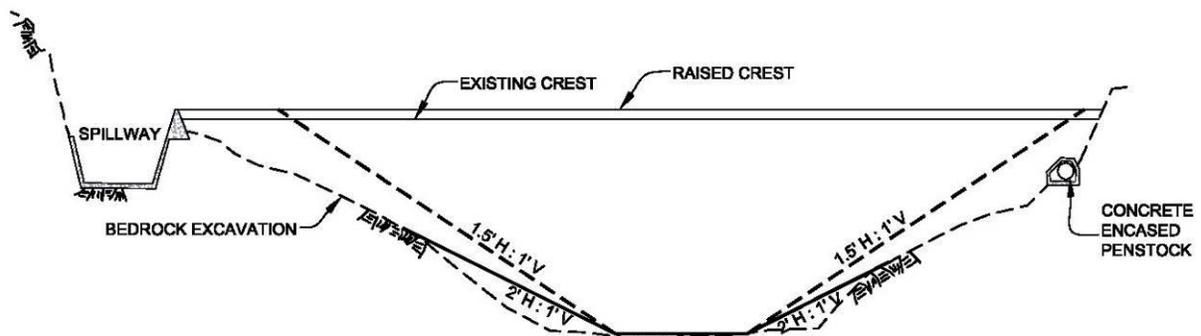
Section View of Iron Gate Dam showing 100-foot-wide Bottom Notch with Different Potential Side Slopes
